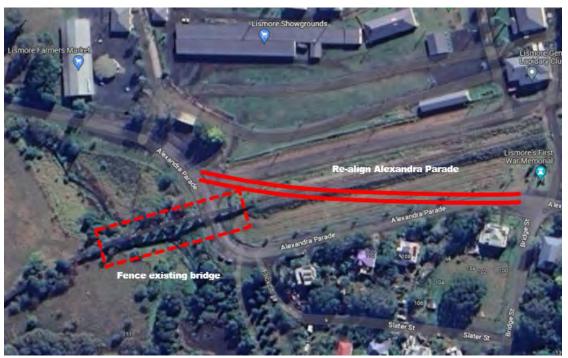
Alexandra Parade proposed alternate route (Source: FBE)
